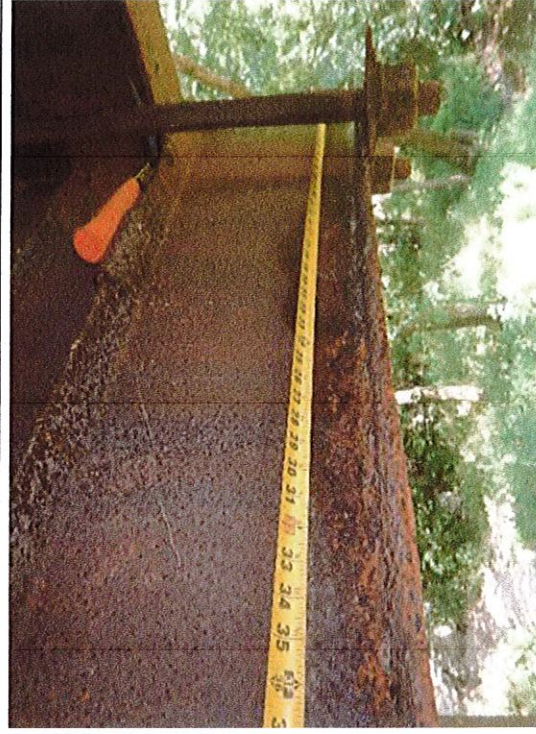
SPAN 2, FLOOR BEAM 2: 50% section loss to lower member bottom flange for east 3' of member
